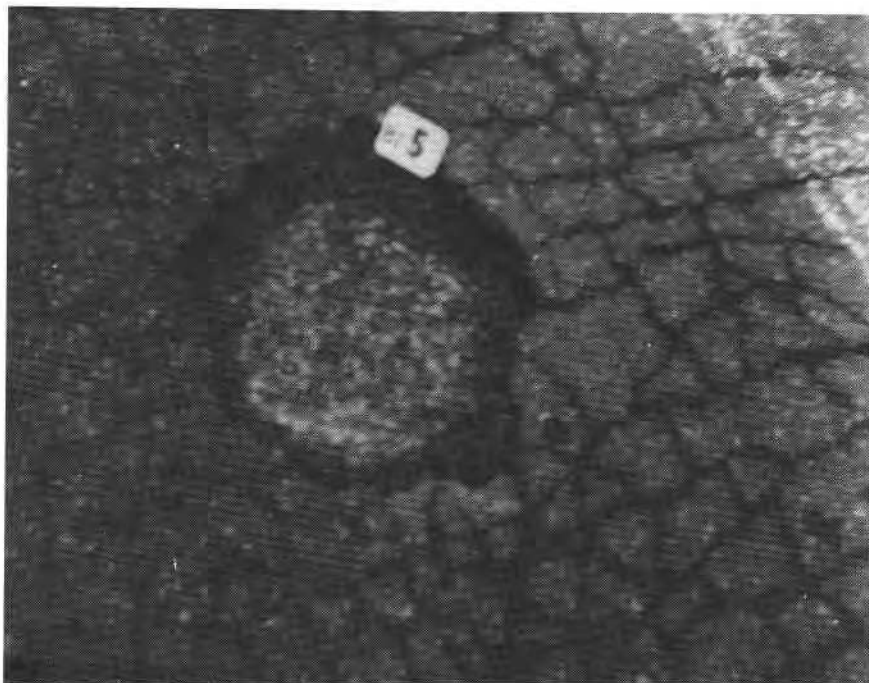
Typical pothole formed when surrounding pavement has badly deteriorated. Pavement type is concrete base with asphalt overlay. Pothole is approximately 40 cm in diameter.
